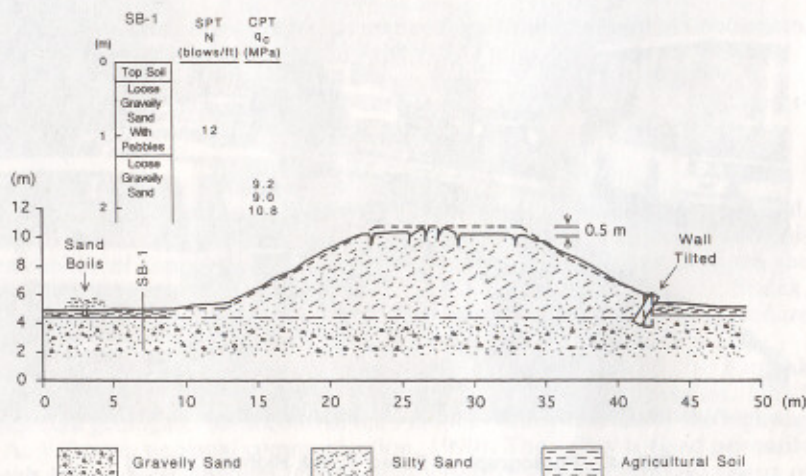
Spitak Highway Embankment Cross Section before and after Failure (Site 1)
